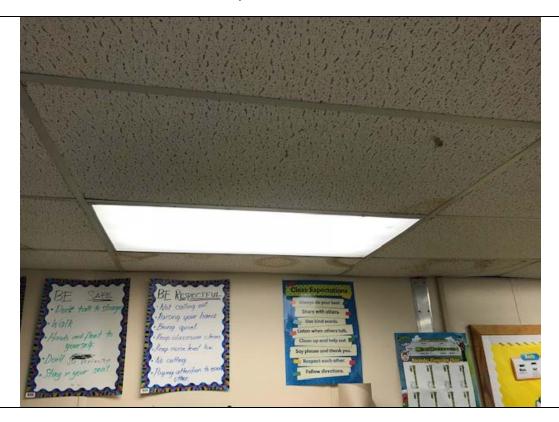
Temporary Building: Multiple water-stained ceiling tiles on ceiling.
